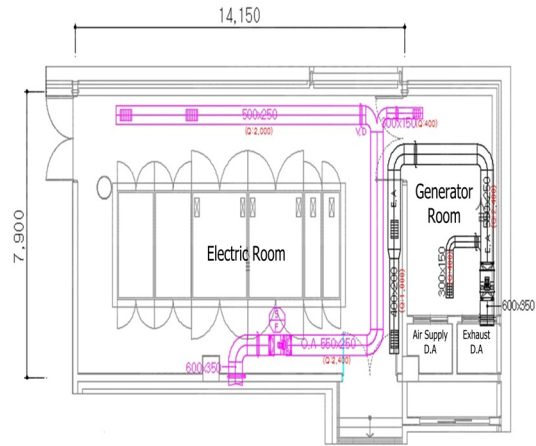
Floor plan of mechanical ventilation equipment in electric room
